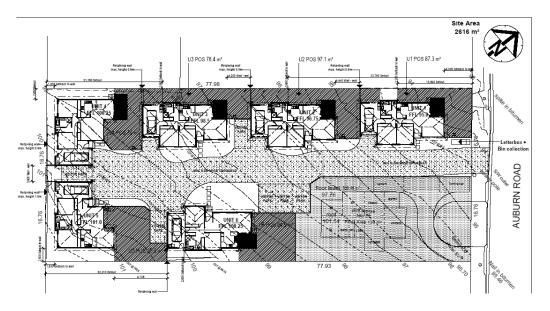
The building layout at Auburn Road Kingston (Source: Wilson Homes)
